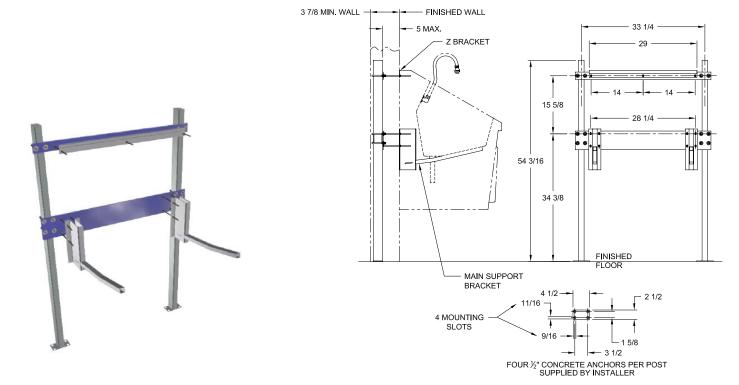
In-line wall carrier mount - SMSSINKCARRIER
